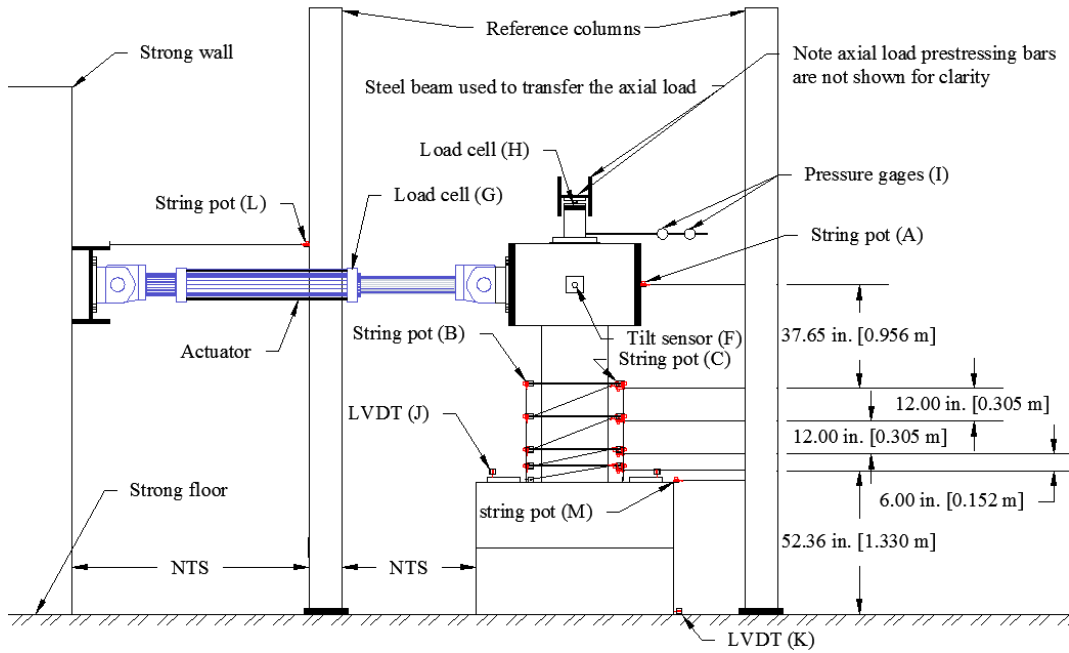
Elevation view of column C5 and C6 external instrumentation
